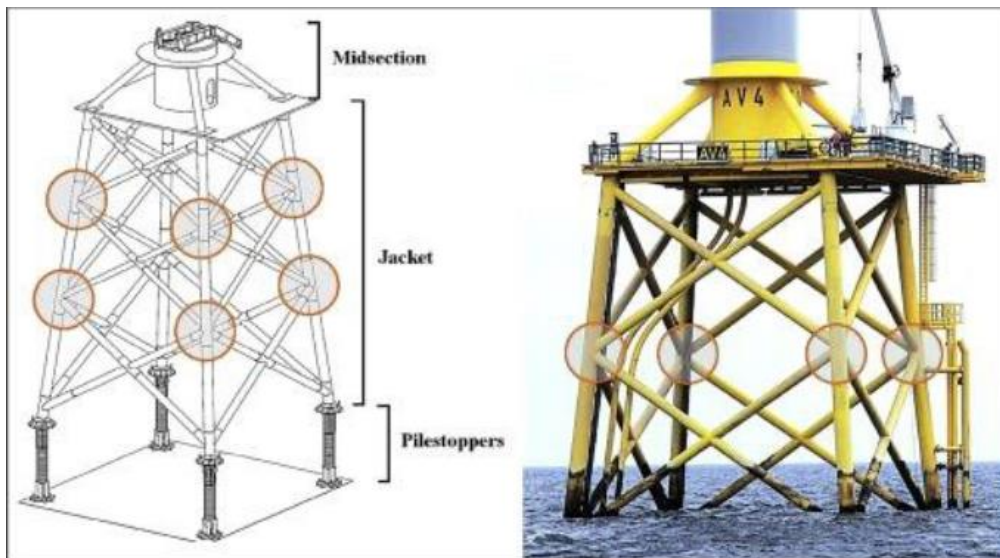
Example of offshore jacket structure with highlighted tubular joints
